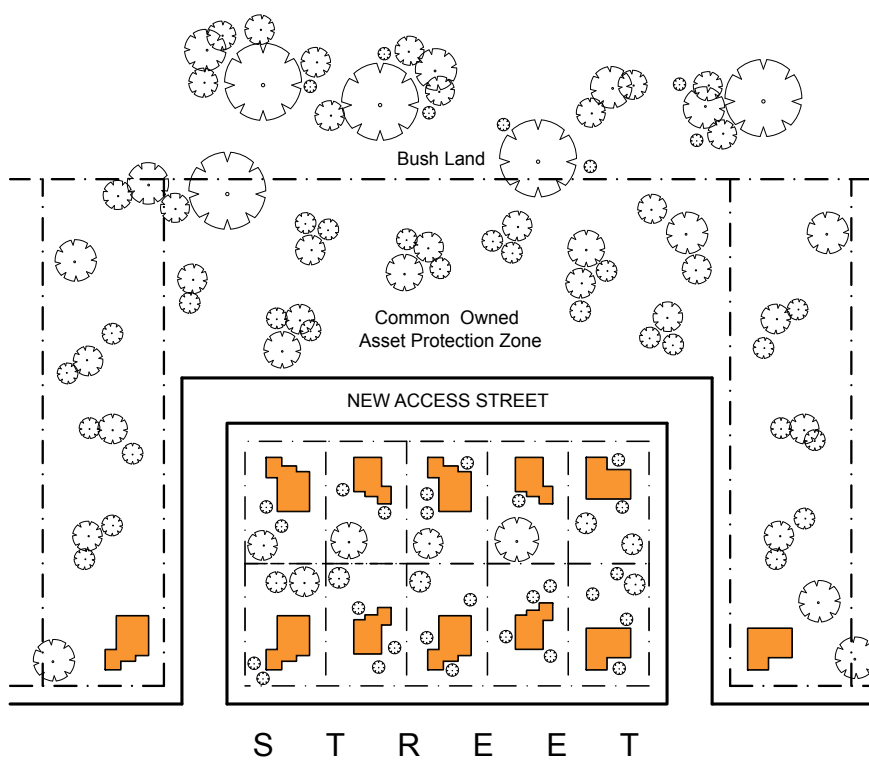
A.5-1. Subdivision of lots, sharing access road between development and APZ
